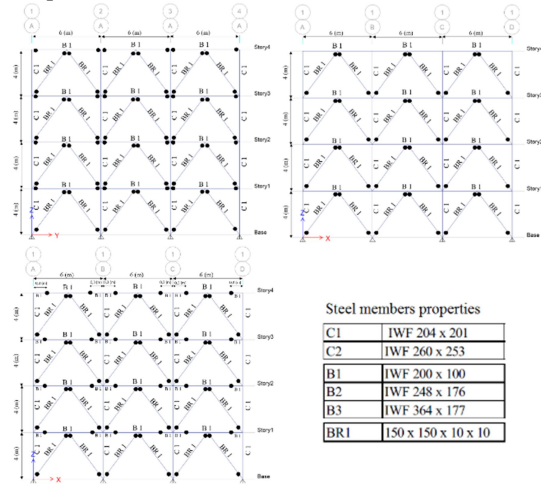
Modeling of exterior BRB frames for Model A, B, and C and the steel members size
